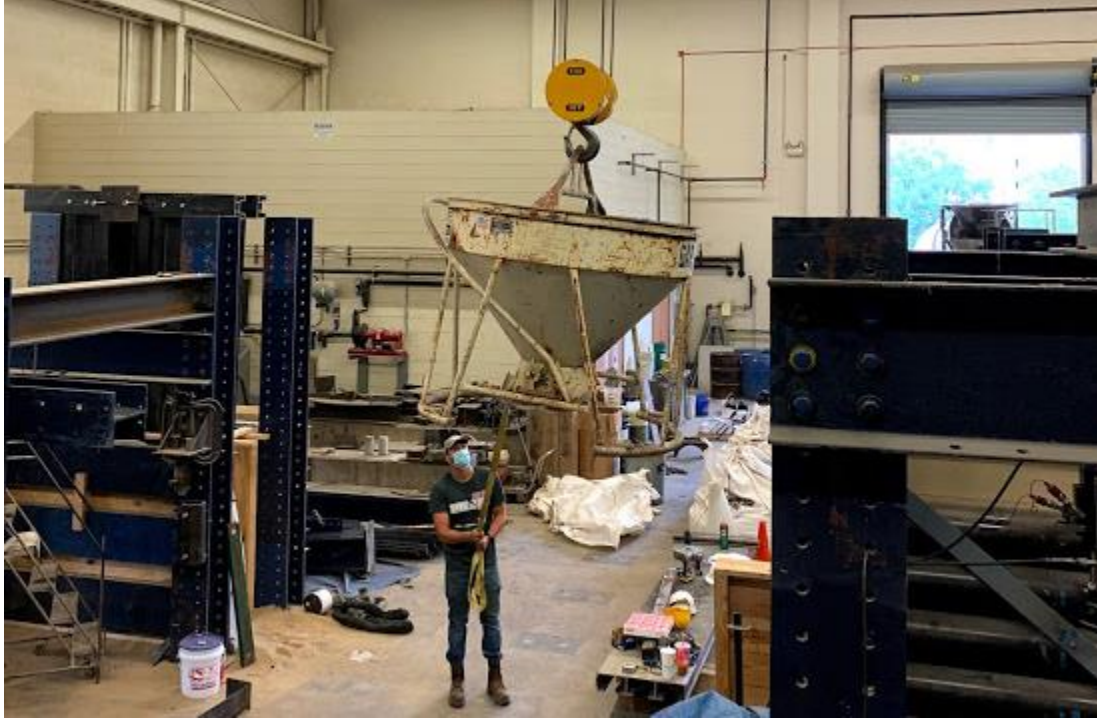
Placement of Concrete Deck Reinforcement
